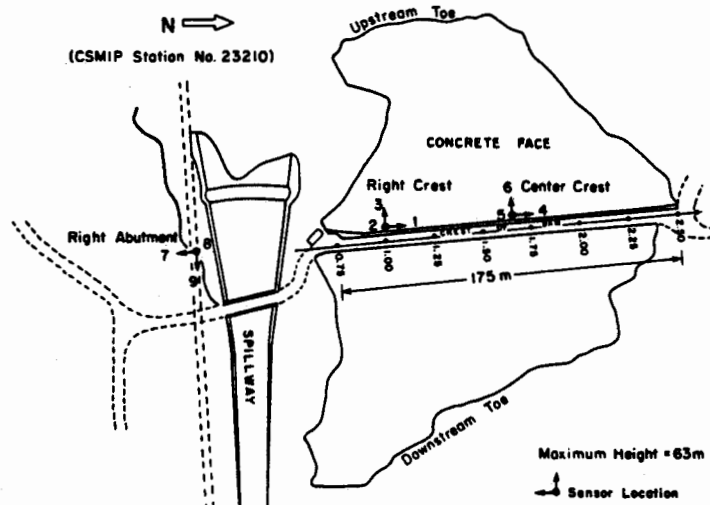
Plan View of Cogswell Dam Showing Sensor Locations
